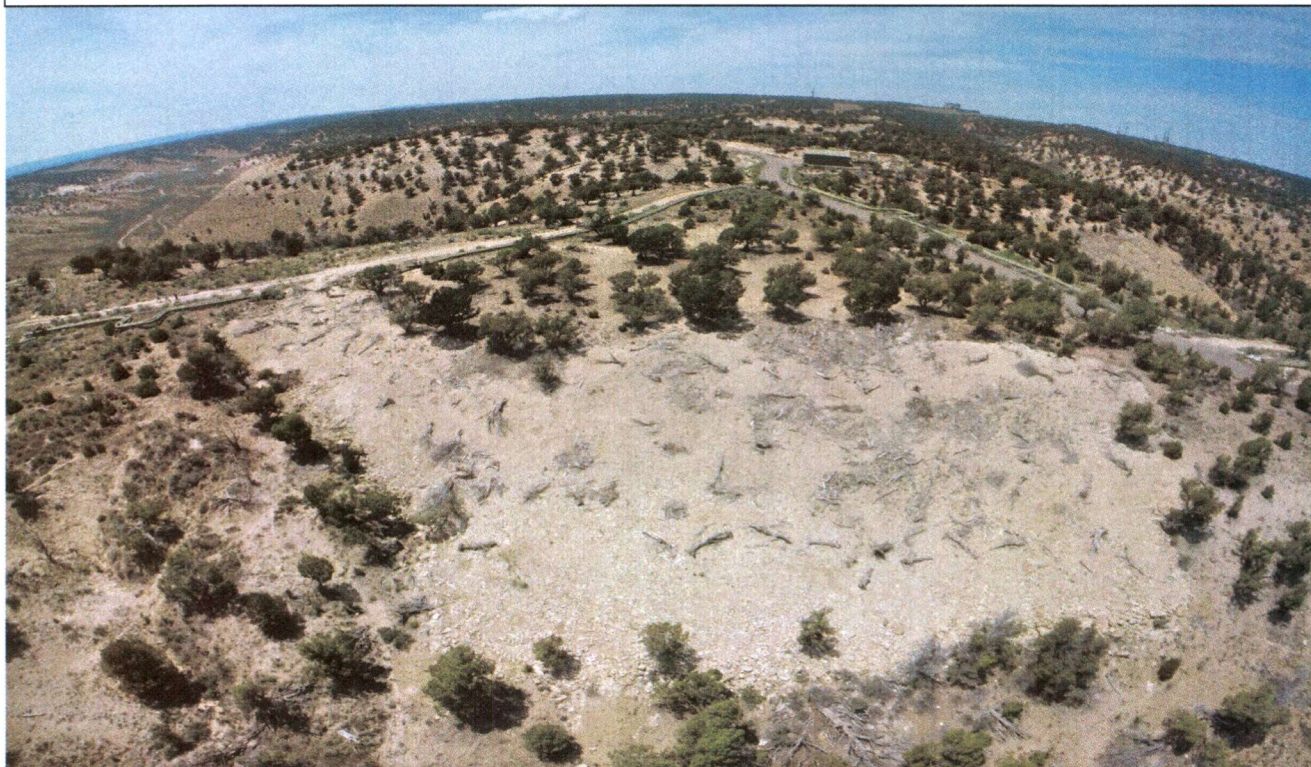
Production well pad 29-24 in fall 2014. Well skid and piping are still in place. This location has an extensive cut slope and the lateral access road into it intersects a complex two leg drainage into Yankee Gulch.
